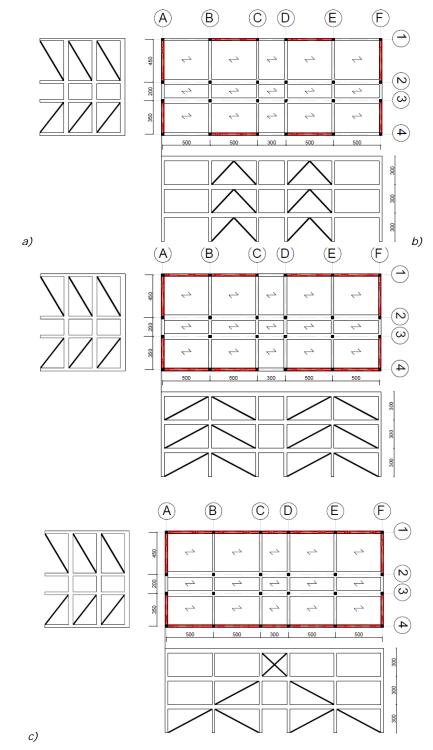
Analyzed configurations for bracings location: a) Chevron Brace layout, b) and c) Diagonal Brace layout
